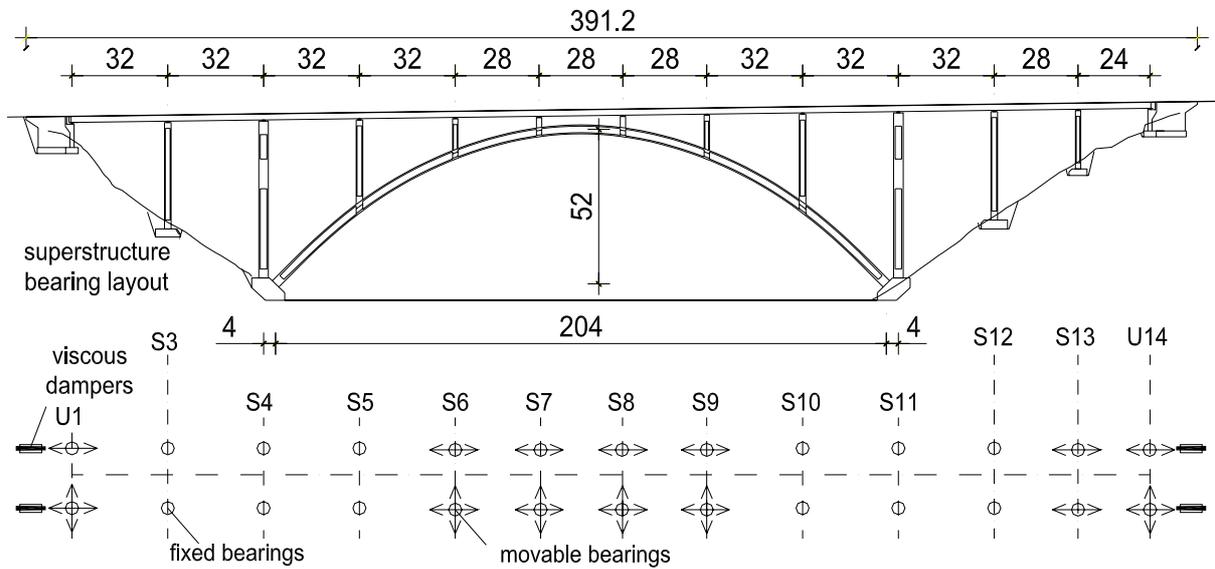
Krka river bridge near Skradin, longitudinal and bearing layout.
